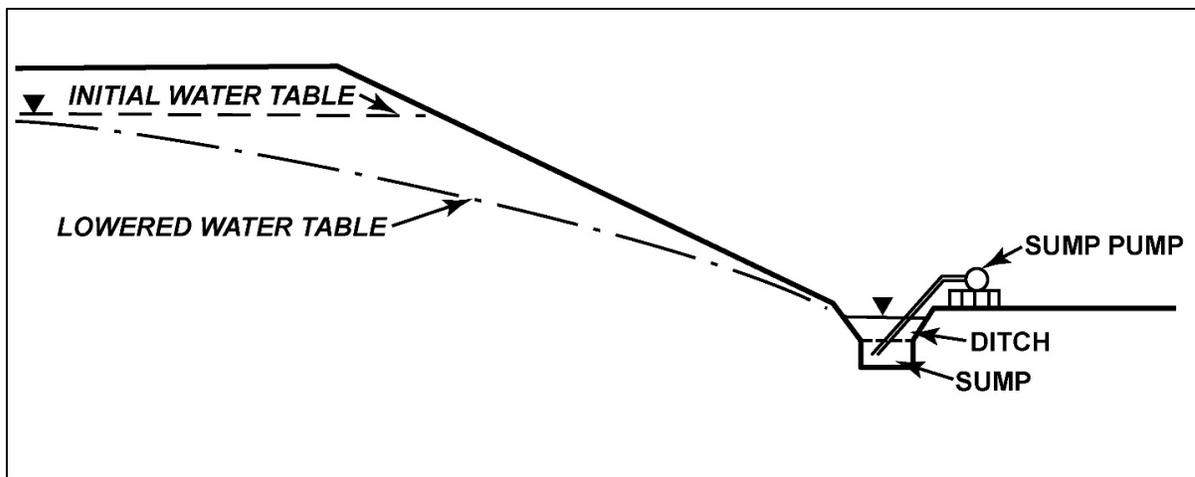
Dewatering open excavation by ditch and sump (Adapted from Leonards, 1962 and TM 5-818-5)
